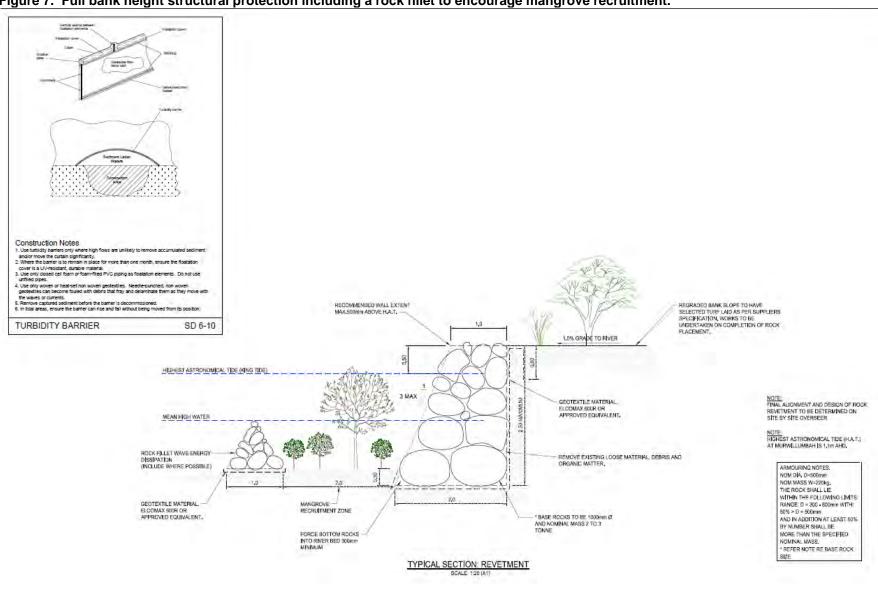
Full bank height structural protection including a rock fillet to encourage mangrove recruitment.
